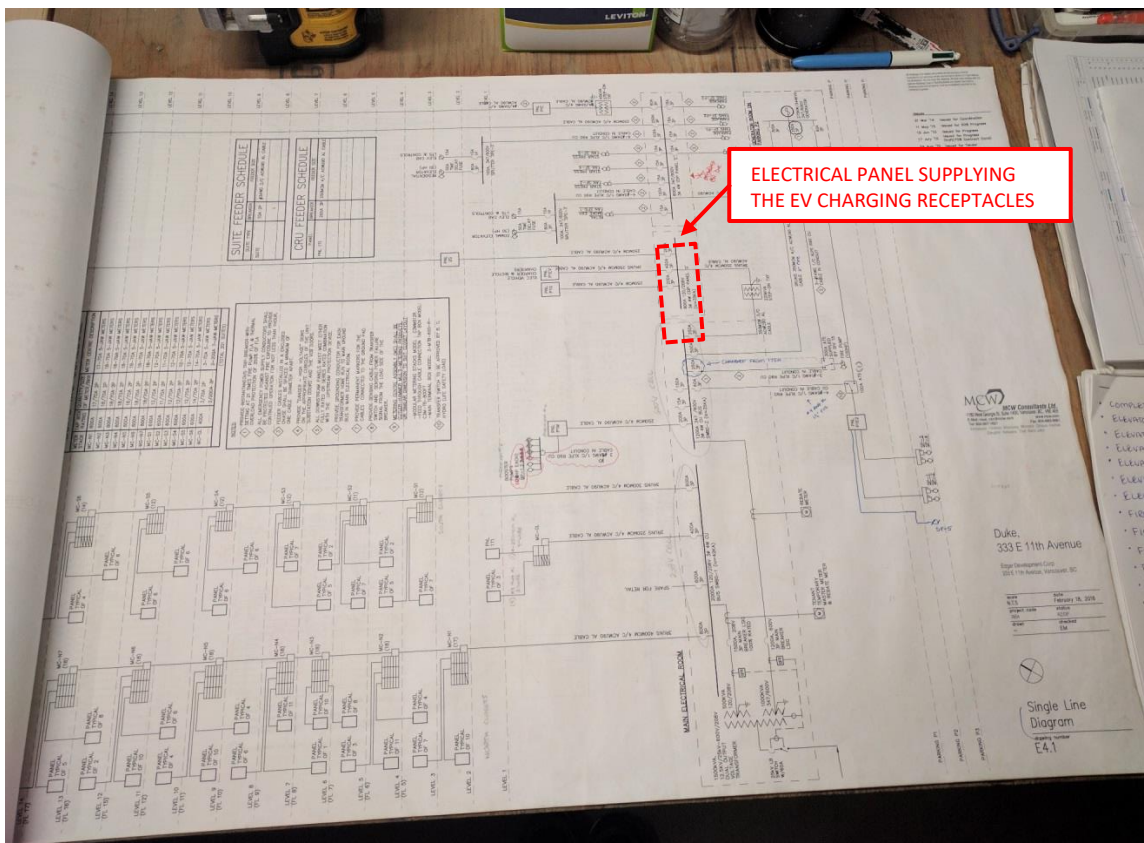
A view of the electrical single line diagram, for the mixed-use building located at 333 East 11th Avenue, showing the LV power distribution arrangement supplying the EV charging infrastructure.
